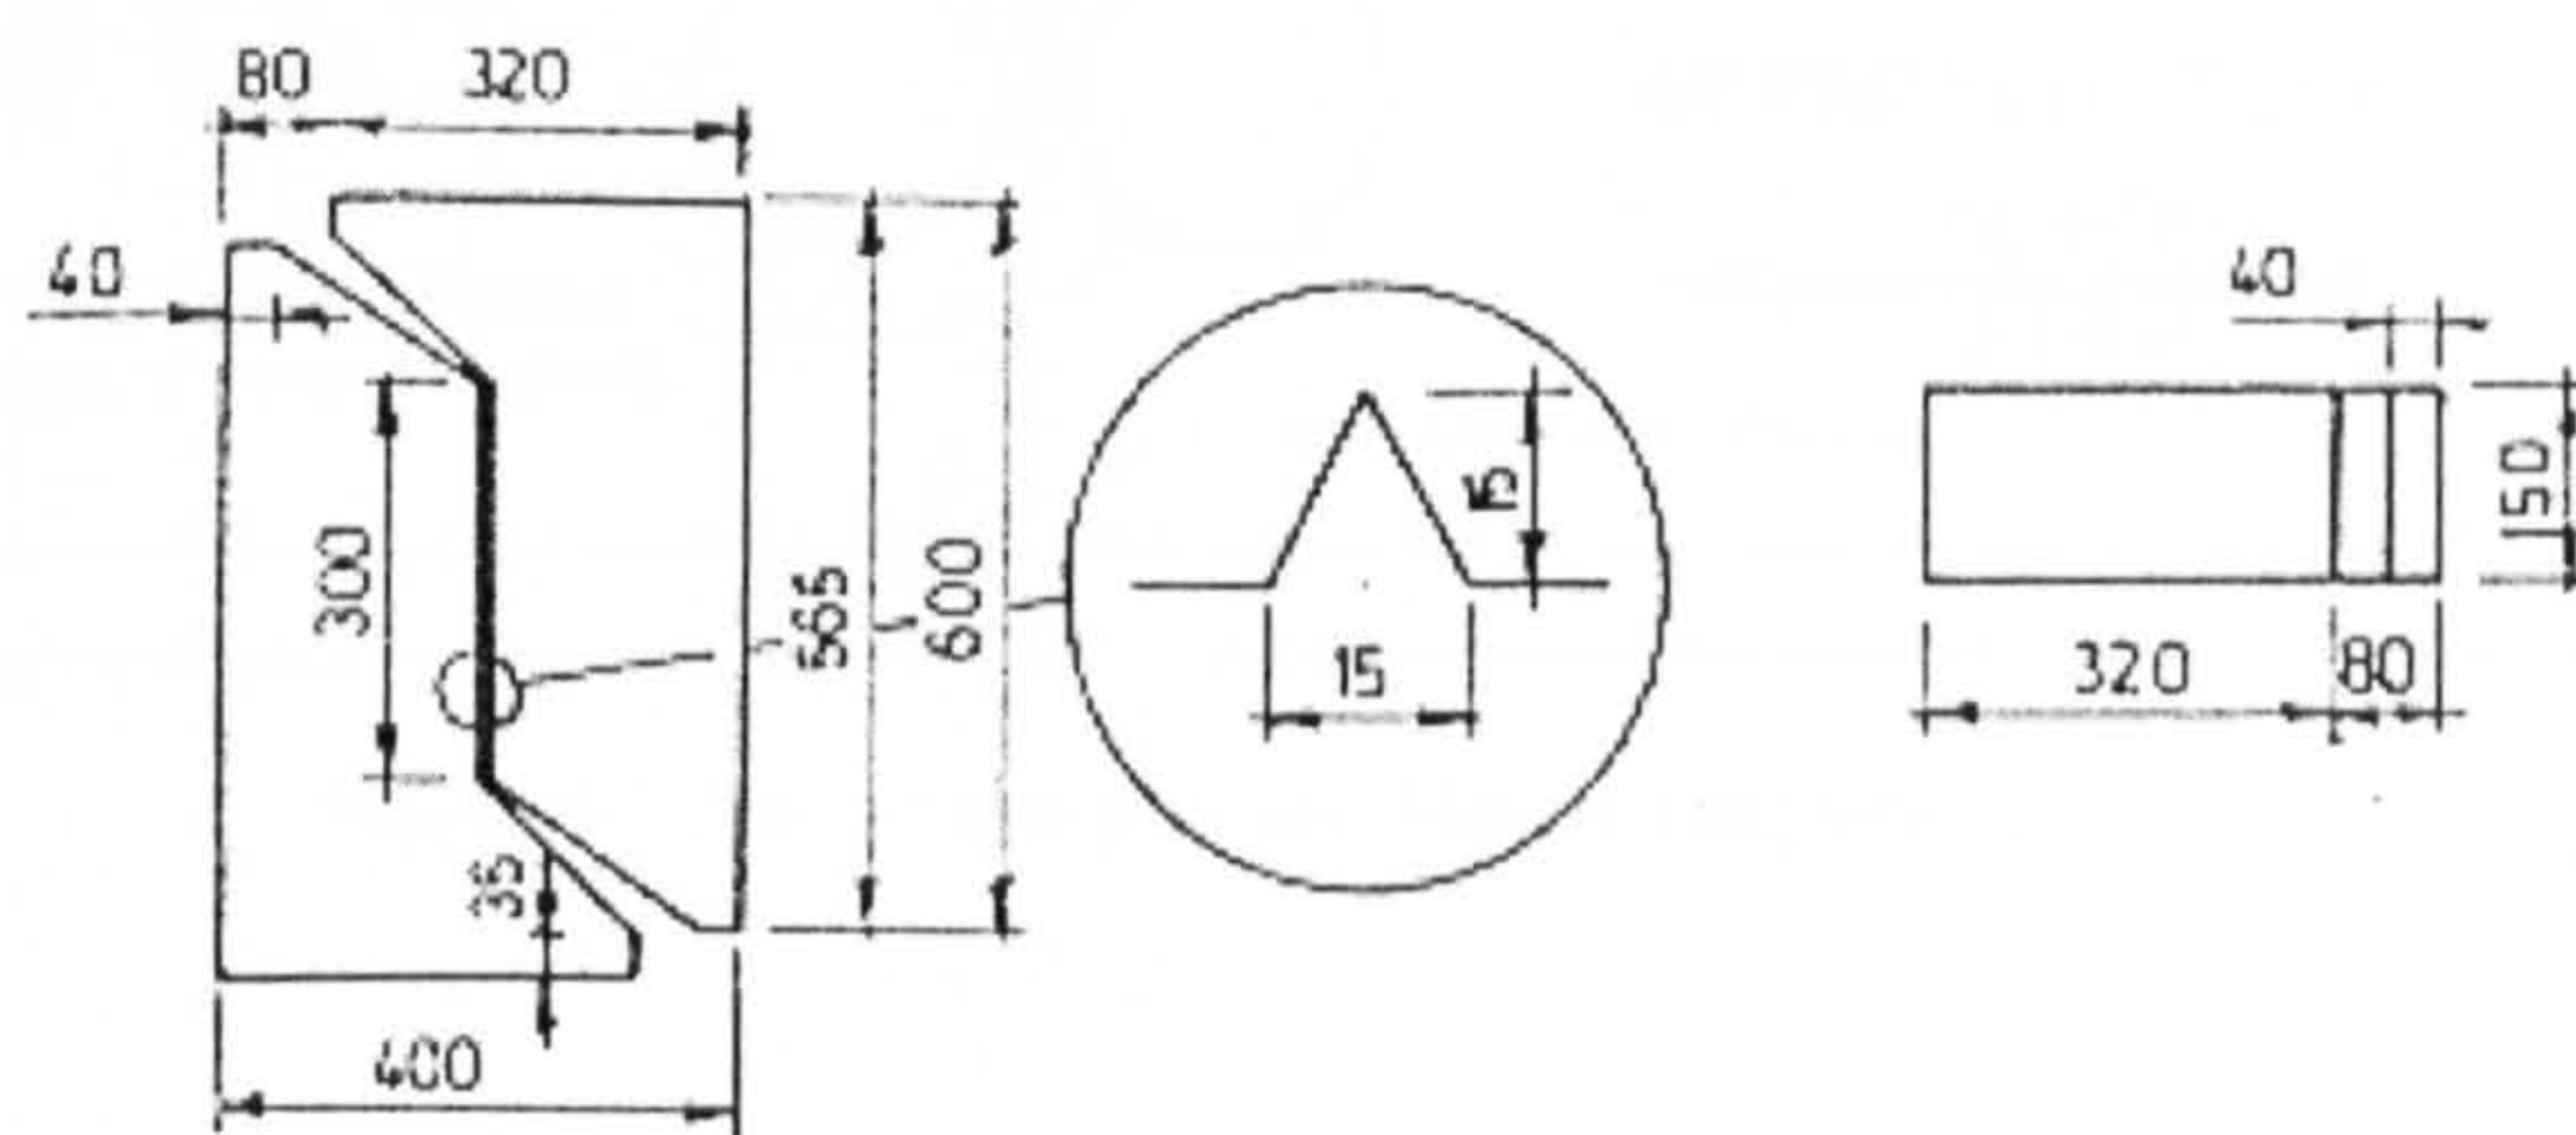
Typical single crack test specimen (Valle and Buyukozturk 1993)
